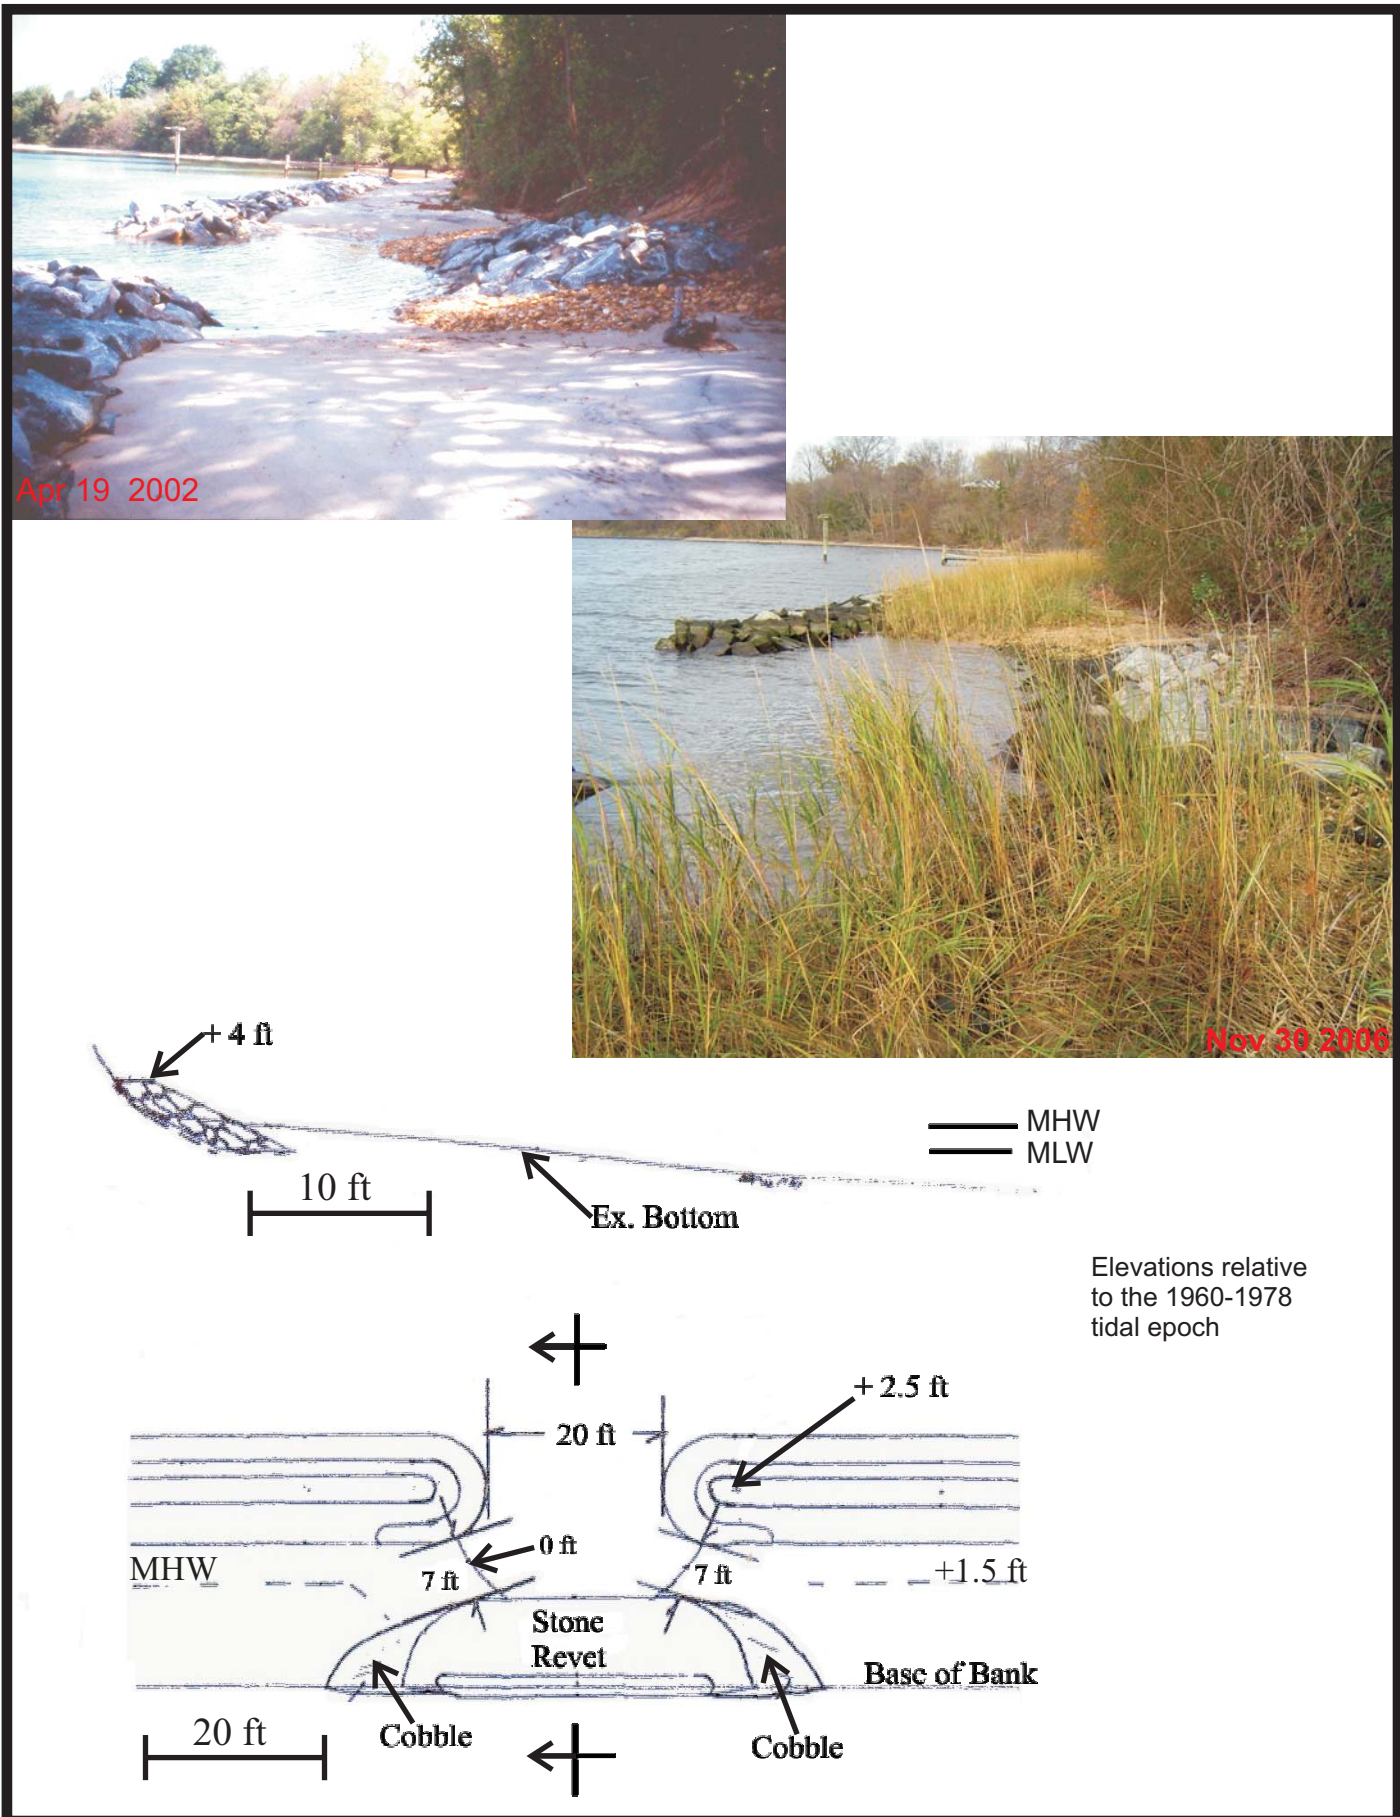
Photos showing Window 9 post construction in 2002 and in 2006. Window 9 is a Type V window or vent along Site 1 with a stone revetment along the backshore shown in the planform and cross-sectional design.
